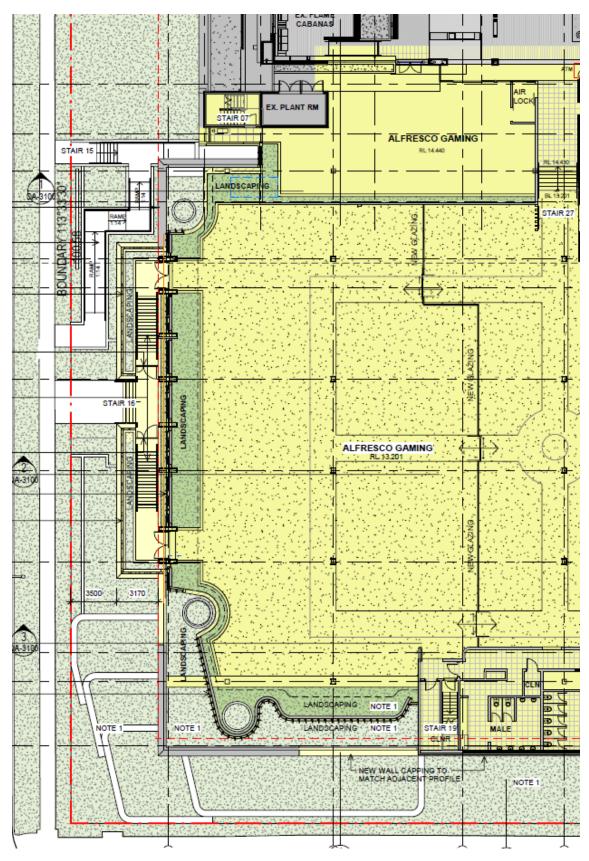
Level 2 proposed plan (Source: Altis Architecture)
